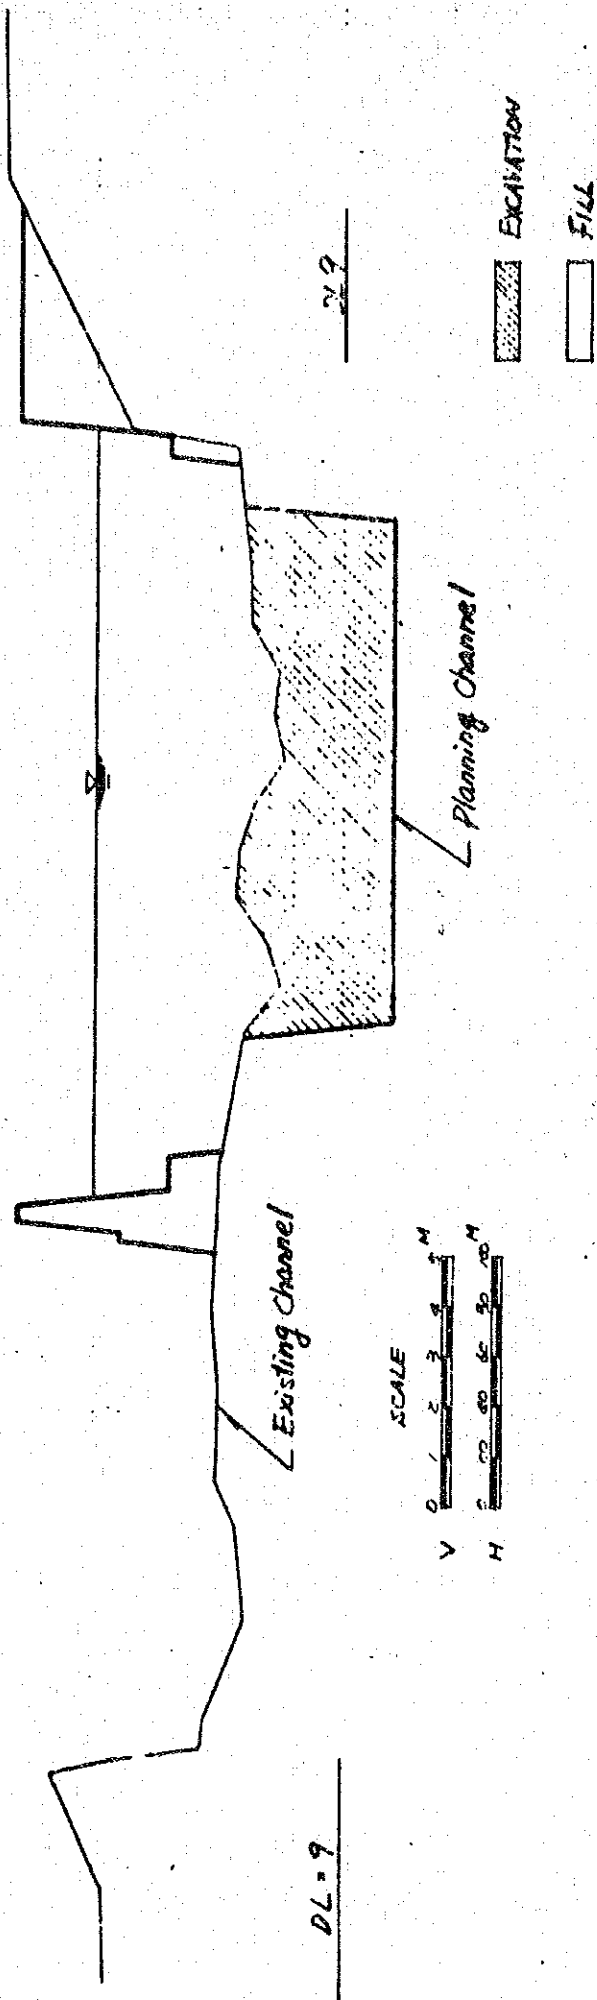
Longitudinal Section of K. Droop River Improvement
